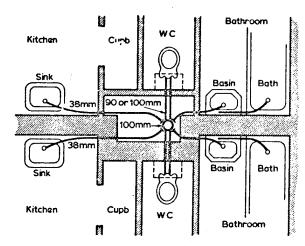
Diagrammatic plan of a typical 'back-to-back' drainage system
